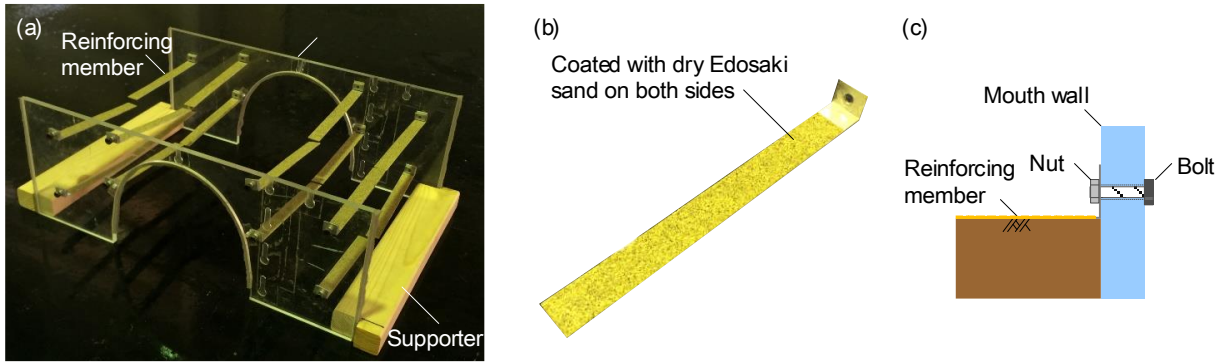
Example of modeling of reinforcing earth wall in dynamic centrifuge tests described in Chapter 4: (a) mouth wall with reinforcing members, (b) reinforcing member, and (c) attachment of reinforcing member to mouth wall.
